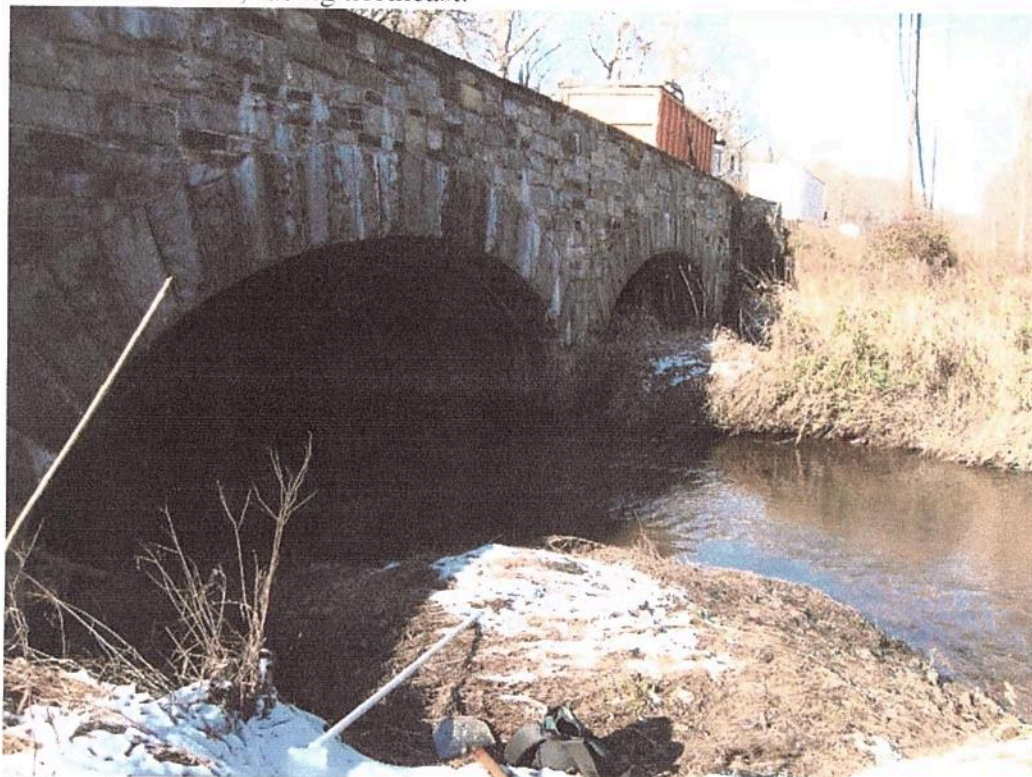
collected from Beaverdam Creek just upstream from the Rt.201 bridge.
